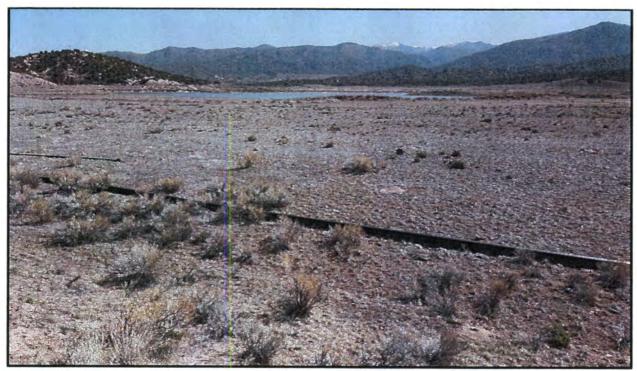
Center of dam crest, looking east across tailings impoundment. Note water pool location within normal limits.
